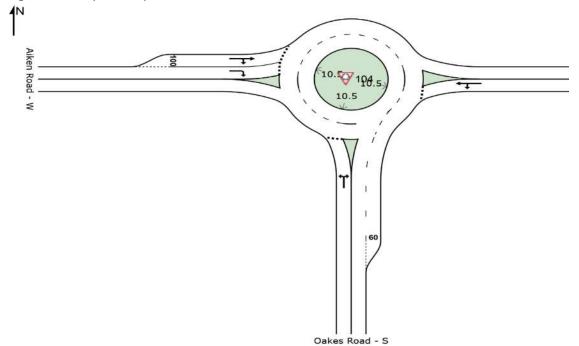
Proposed Layout at Aiken Road / Oakes Road intersection
